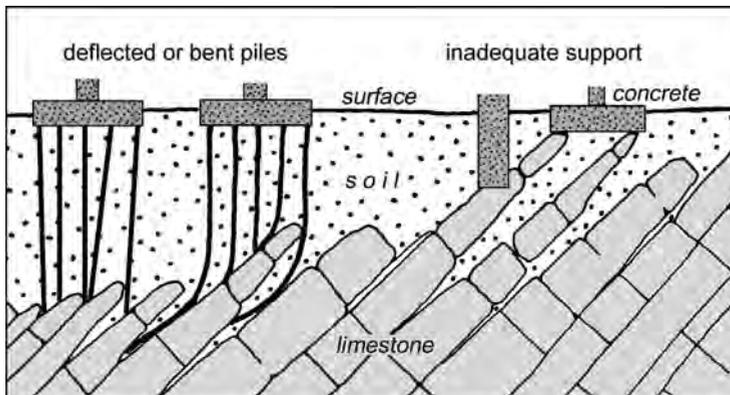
Unsafe foundations on pinnaced rockhead in karst due to deflected or bent driven piles and to footings on inadequate pinnacles.
